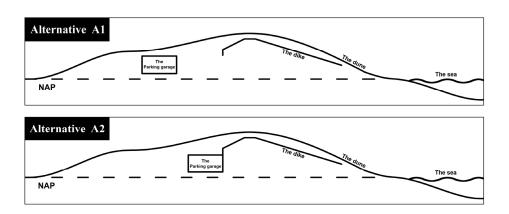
, the cross sections of Alternatives A1 and A2, in which the parking garage is located in the land side of the dike
